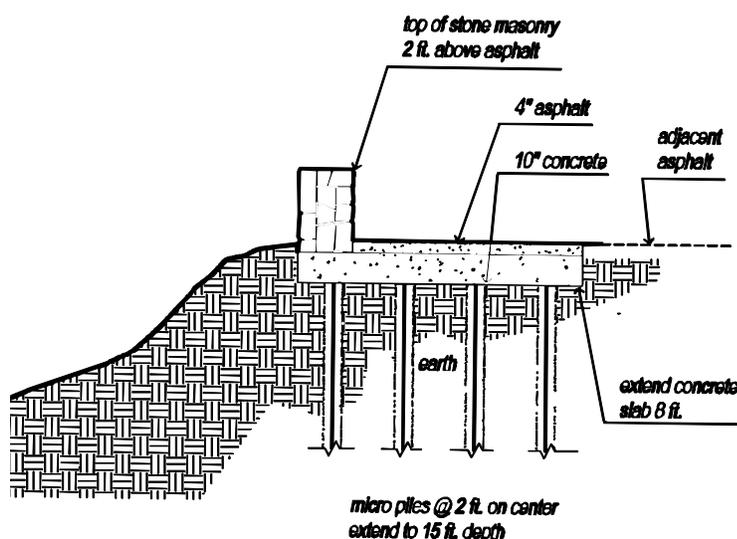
Installation of stone masonry guardwall on concrete slab, anchored with micropiles
